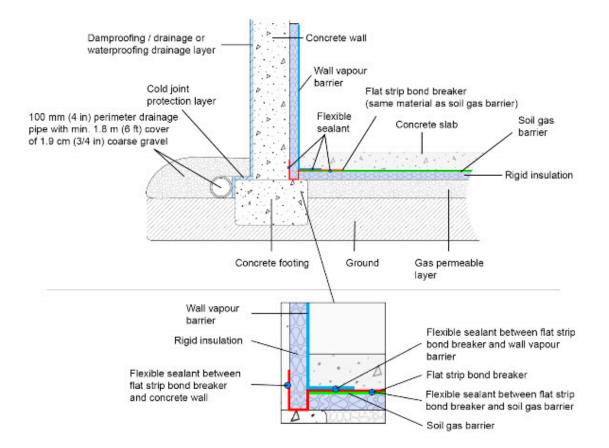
Installation of soil gas barrier on concrete foundation (with insulation)
